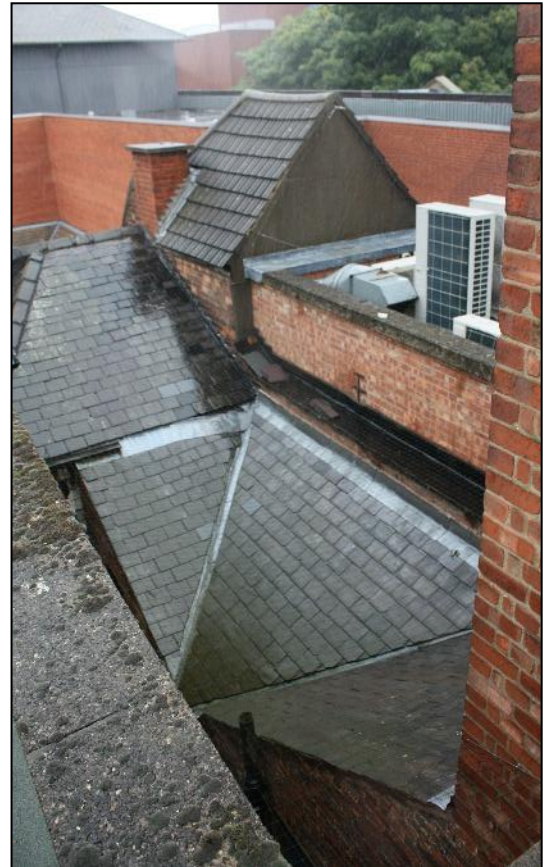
View from the roof over unit D showing the complex sloping roof over G and the steep gabled roof of unit H.
